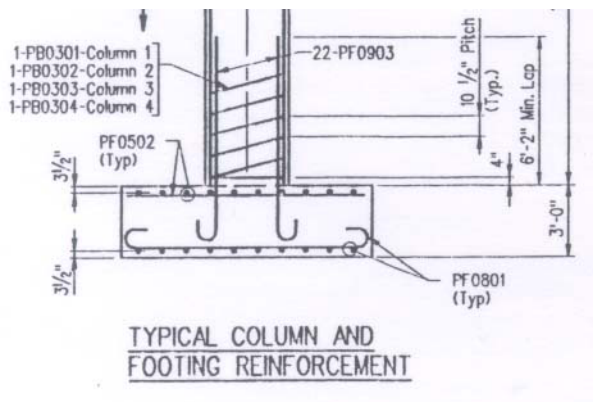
Lap splices that are used at the bottom of the columns of the West Bound Bridge
